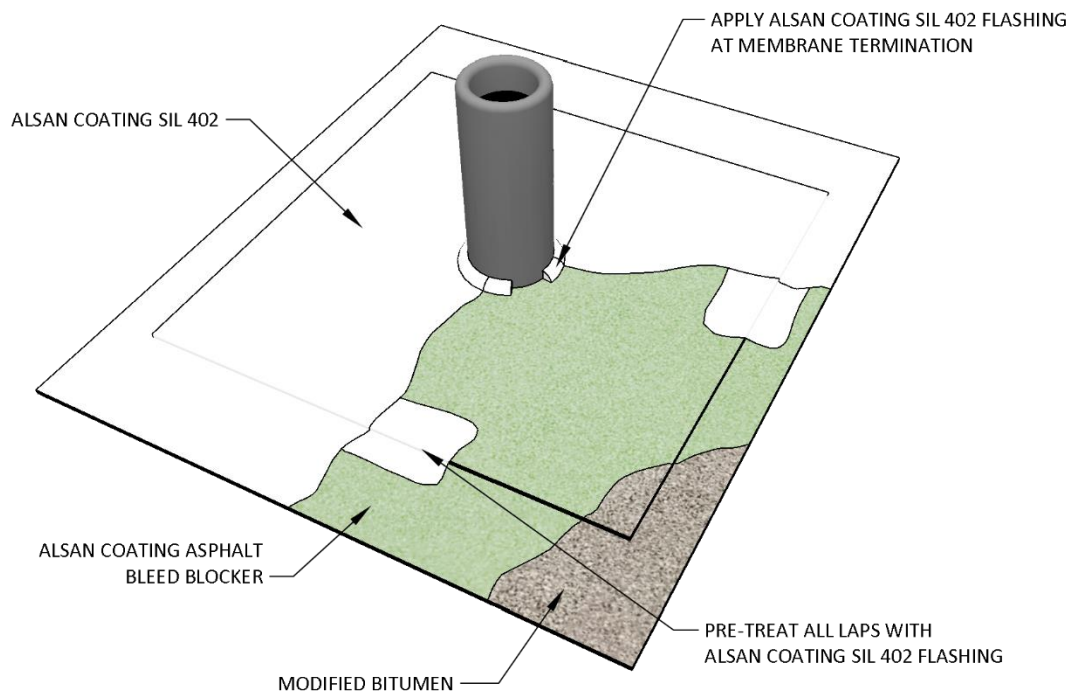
Silicone Roof Coating Over Modified Bitumen, Penetration
